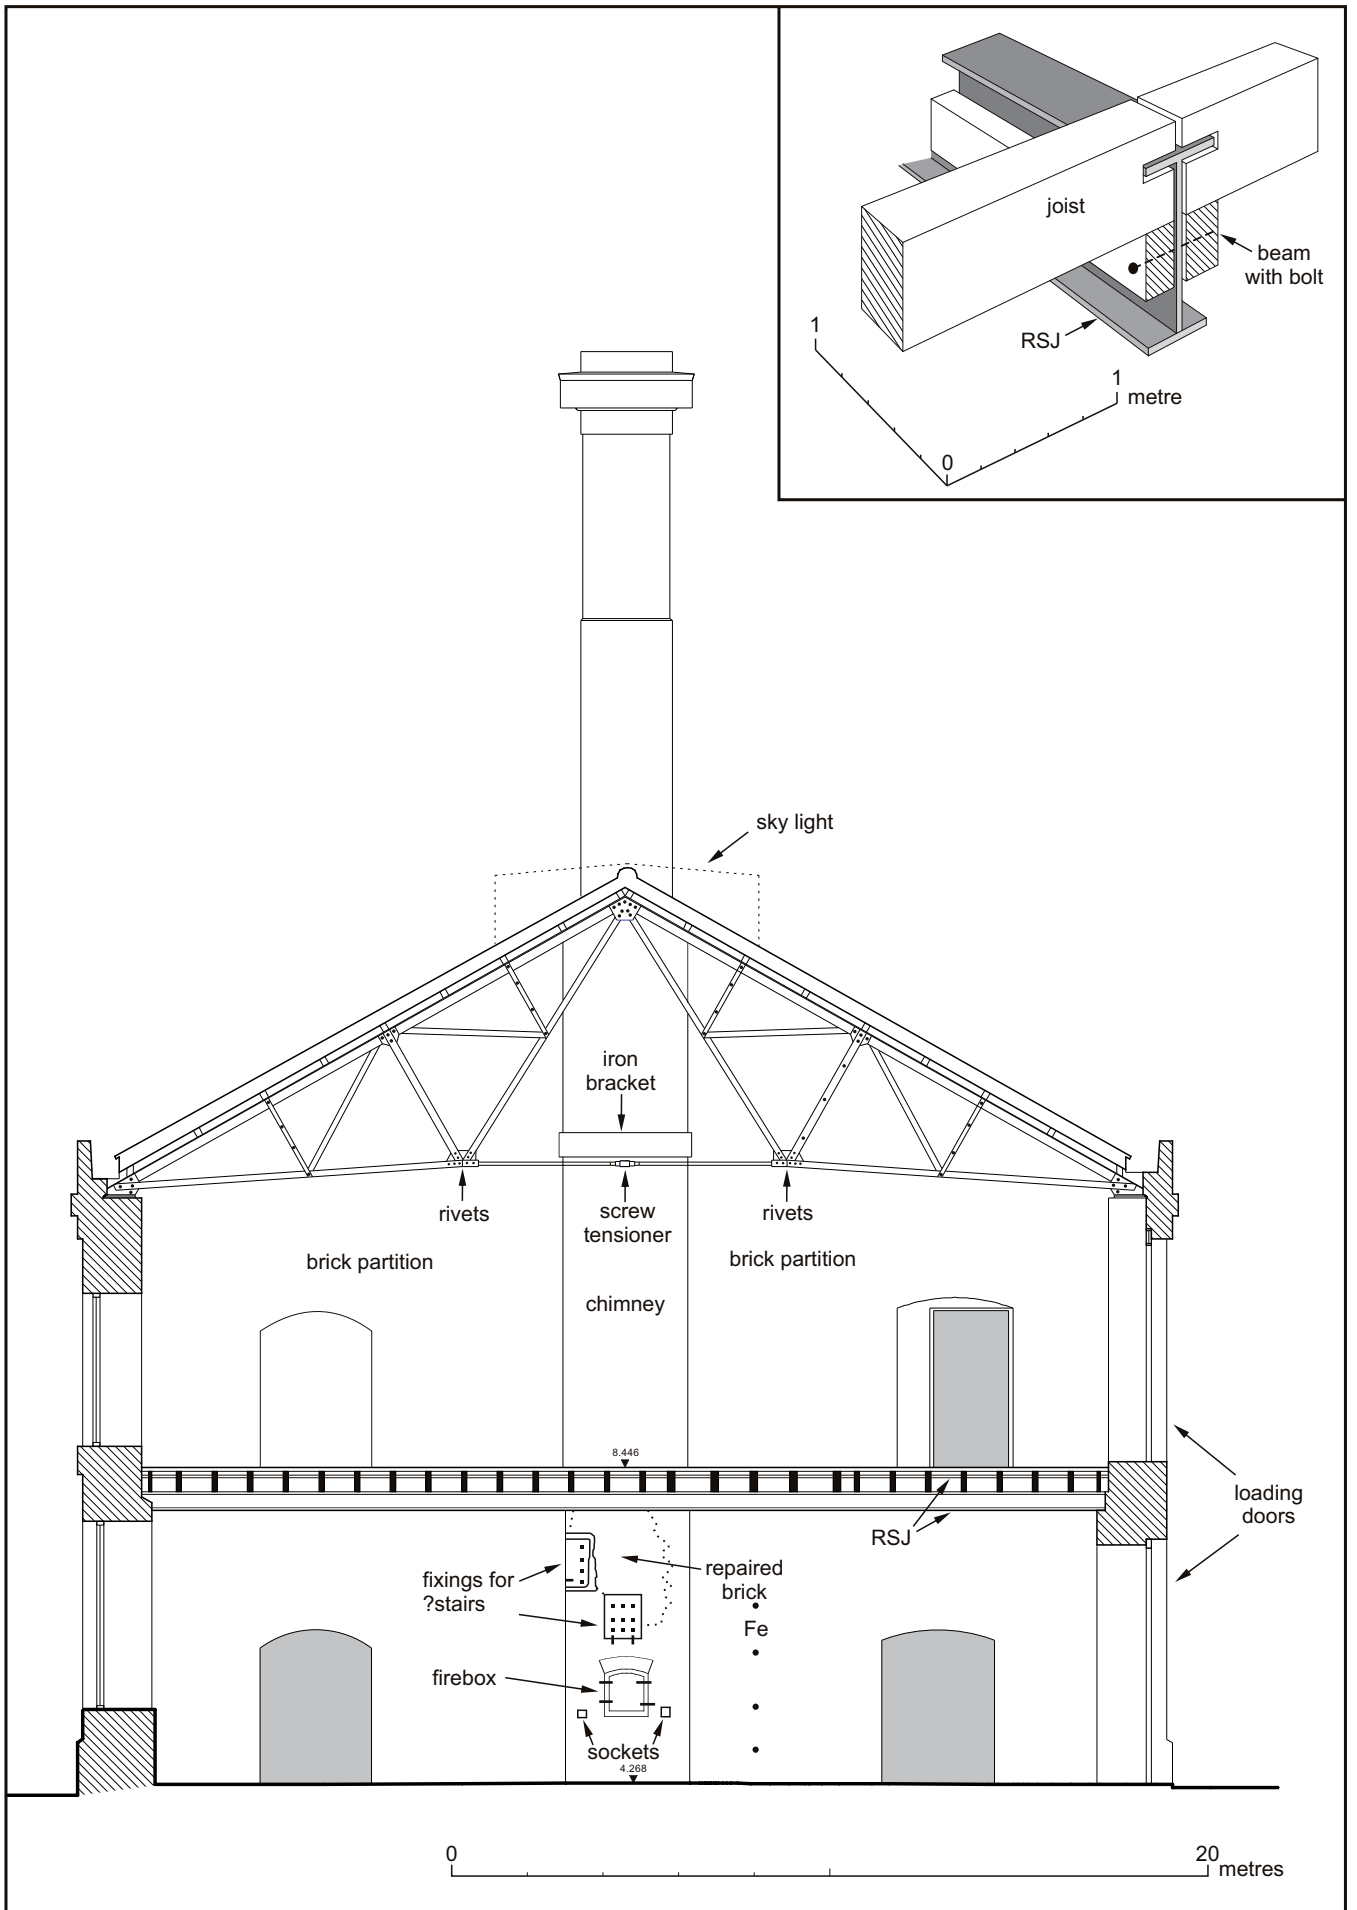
Profile A-A through building and the partition wall along profile A2-A2. Inset showing detail of first-floor construction materials.
